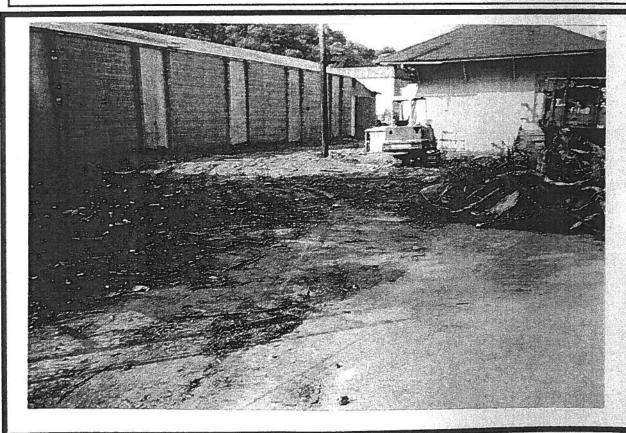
Old Depot Excavated Apage 45 hanges Shown Since 9/9/93 Photos (Photo 2 of 4)
